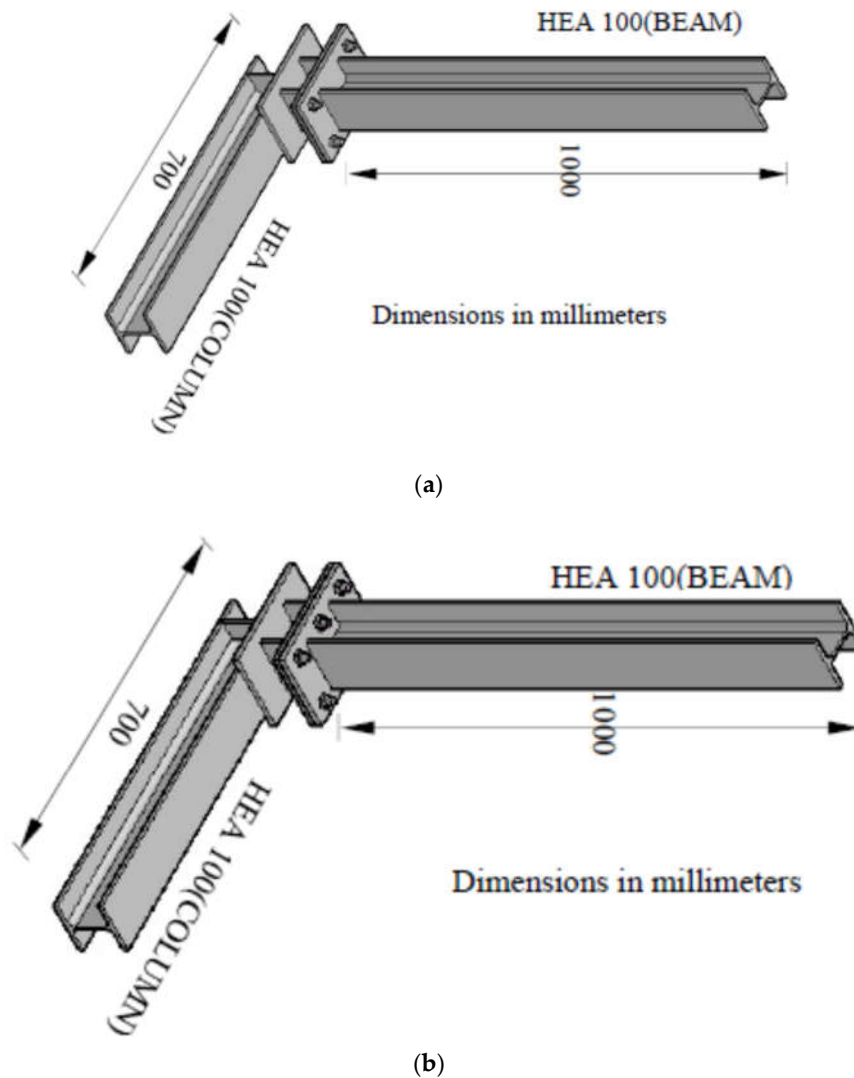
Three-dimensional schematic view of the investigated steel bolted joints: (a) JL-4 bolted joint specimen and (b) JL-6 bolted joint specimen.
